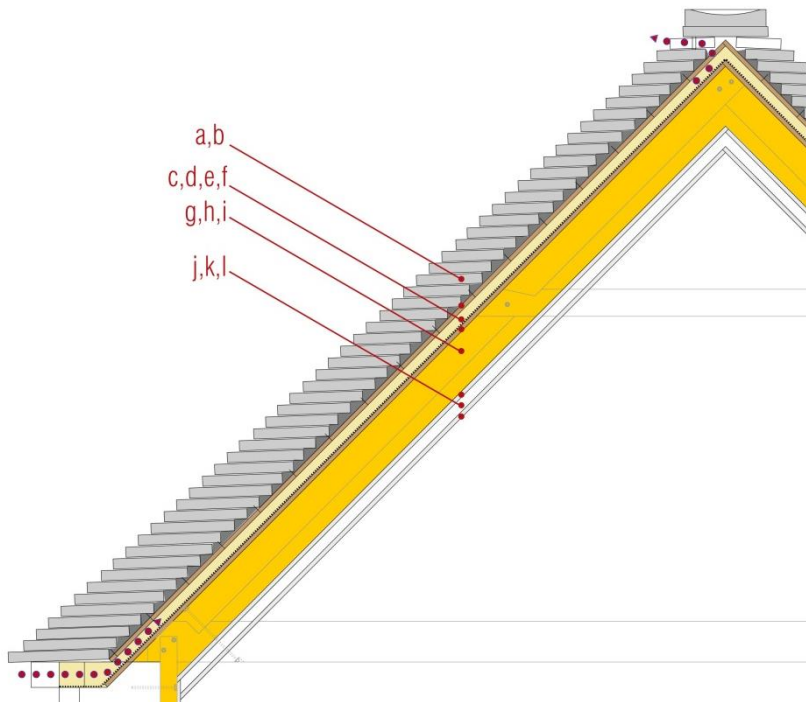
An example of roof construction using spiral screws partly nailed in roof boards. Stone plates are applied in mortar. Construction has air flow channel with secondary roof membrane, thick thermal insulation and air tight membrane. Light plaster boards with installation chamber. Drawing: Domen Zupančič.
